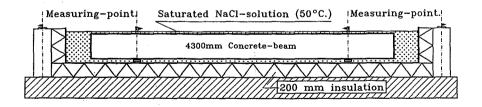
Storage tank (5000x1000x500 mm) for concrete specimen. Measuring points for longitudinal and transverse expansions are shown.
